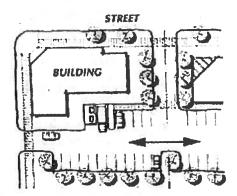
Shared parking and access serve to connect commercial projects
